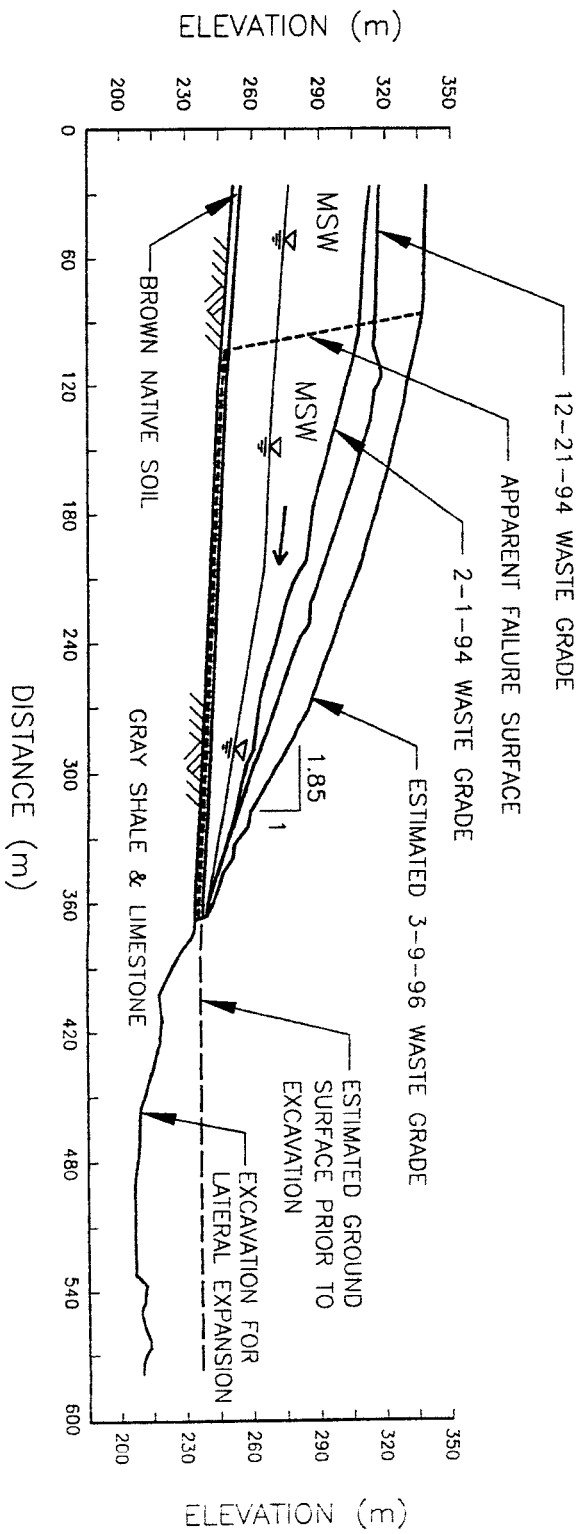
Slope Cross-Section B-B' Showing Recent Waste Placement
